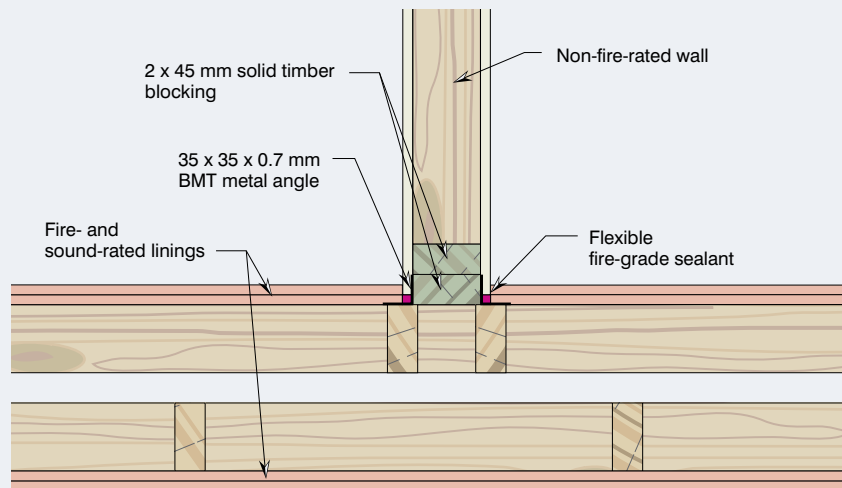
One recommended method for the intersection of an internal non-fire rated wall to a bounding fire and acoustic-rated wall
